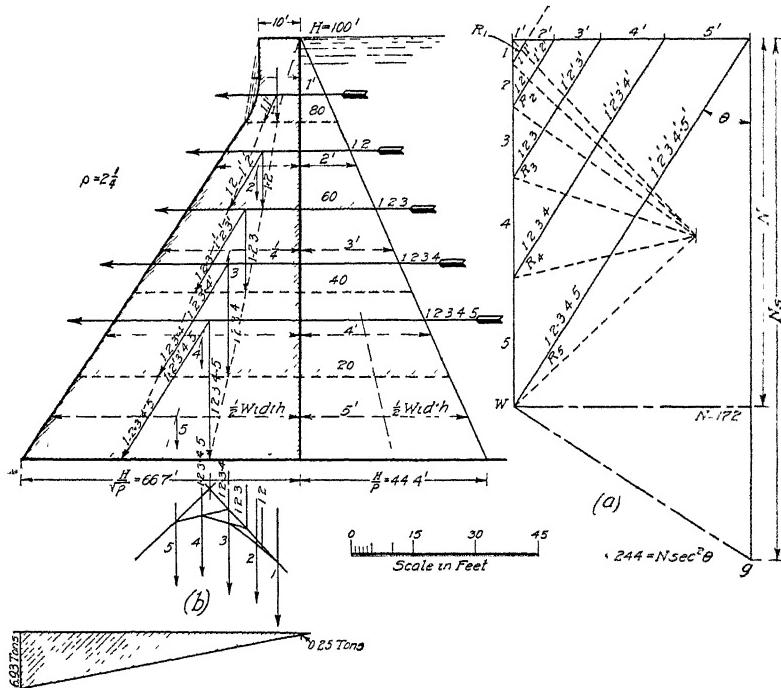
Graphical Construction for Tracing Lines of Pressure on Dam of Pentagonal Profile
